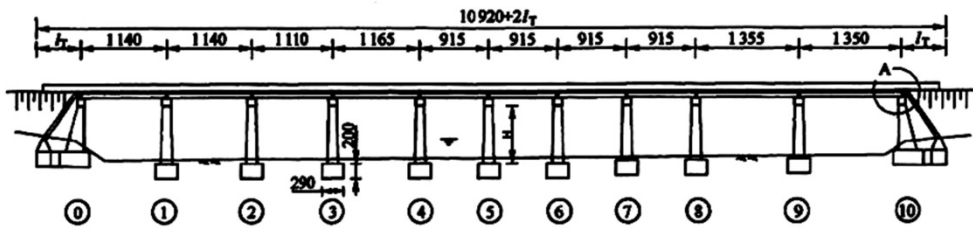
Elevation layout of "Longtan Bridge" in China (Unit: cm) (Tang et al., 2007)
